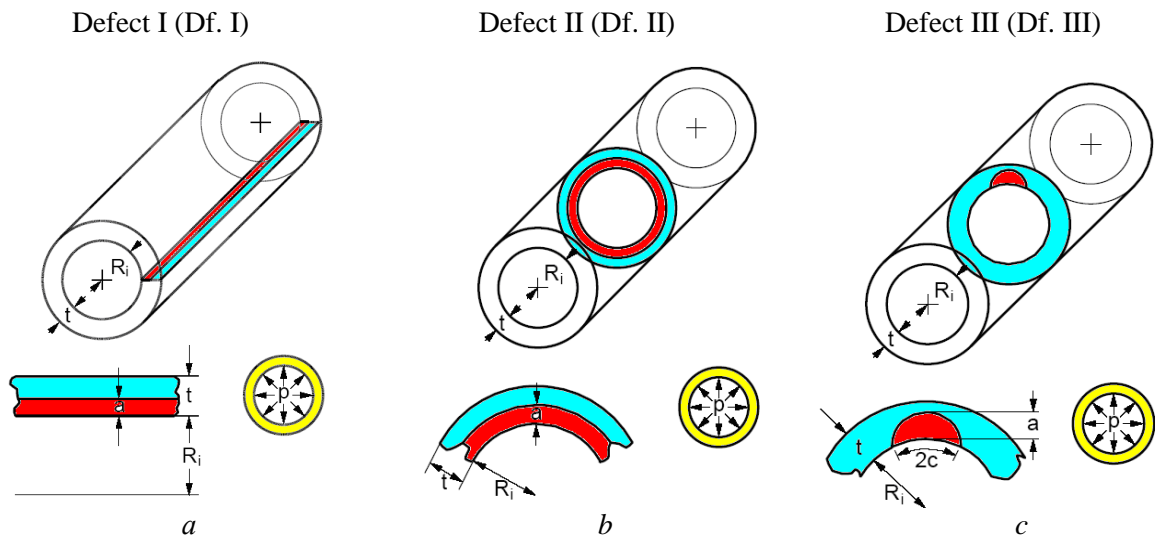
Potential defects on the internal surface of pipeline: a) longitudinal defect (Df. I); b) circumferential defect (Df. II); c) semielliptical defect (Df. III).
